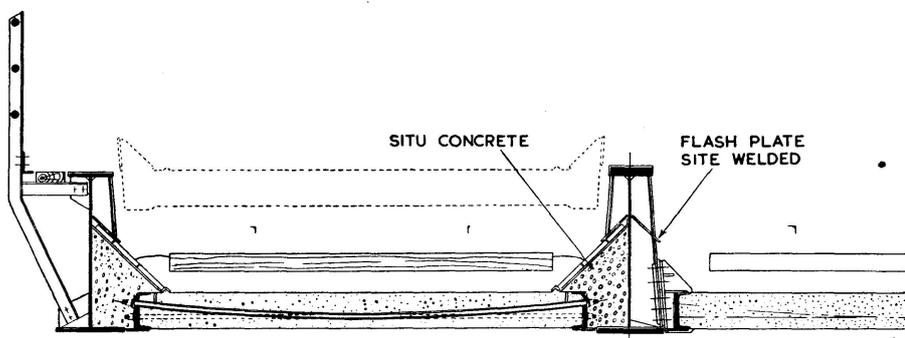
A pair of steel cross girders held apart in a condition of prestress while the concrete is being cast around the upper girder
